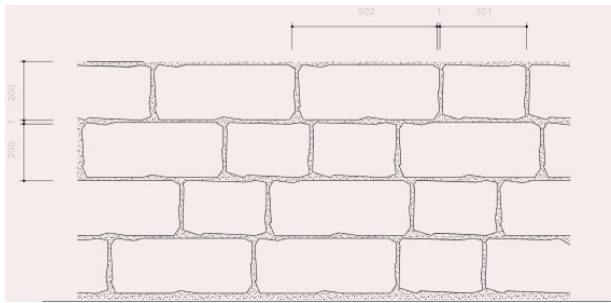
Dressed quarry stone wall in Kaaki building (idem).
